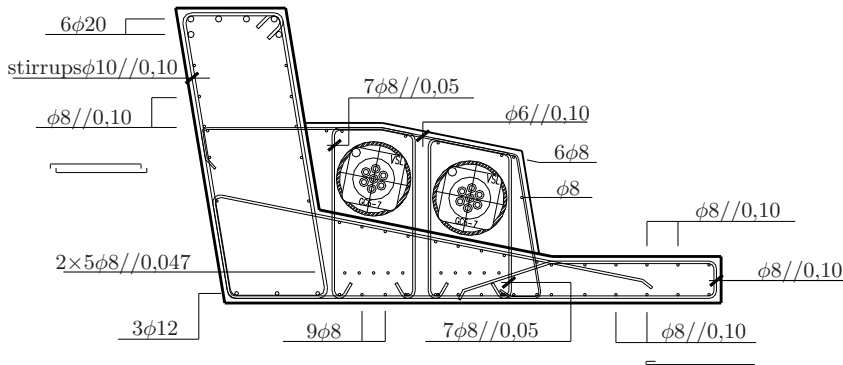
Reinforcement in the blister anchorage zone - Cross section
